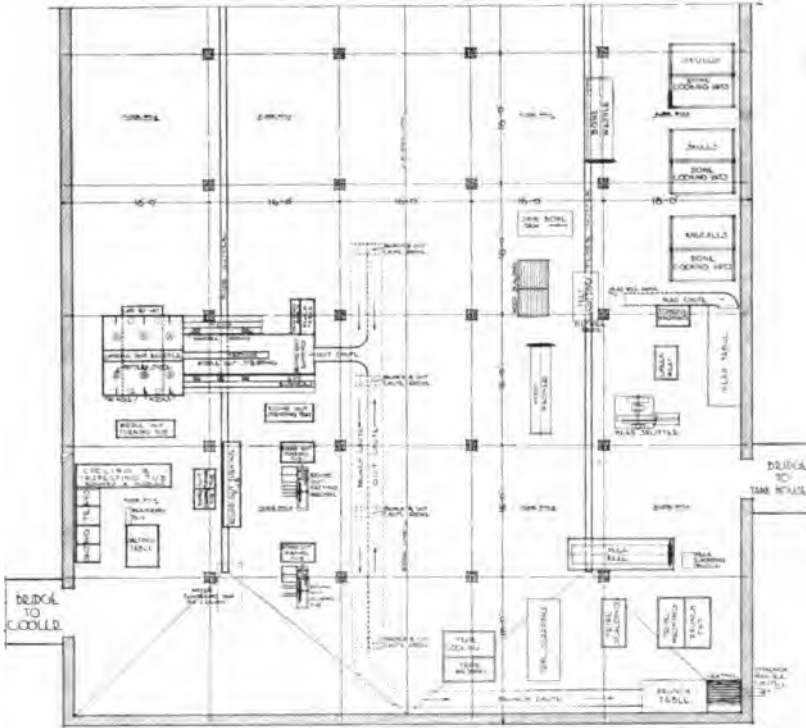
PLAN OF BEEF OFFAL FLOOR.
